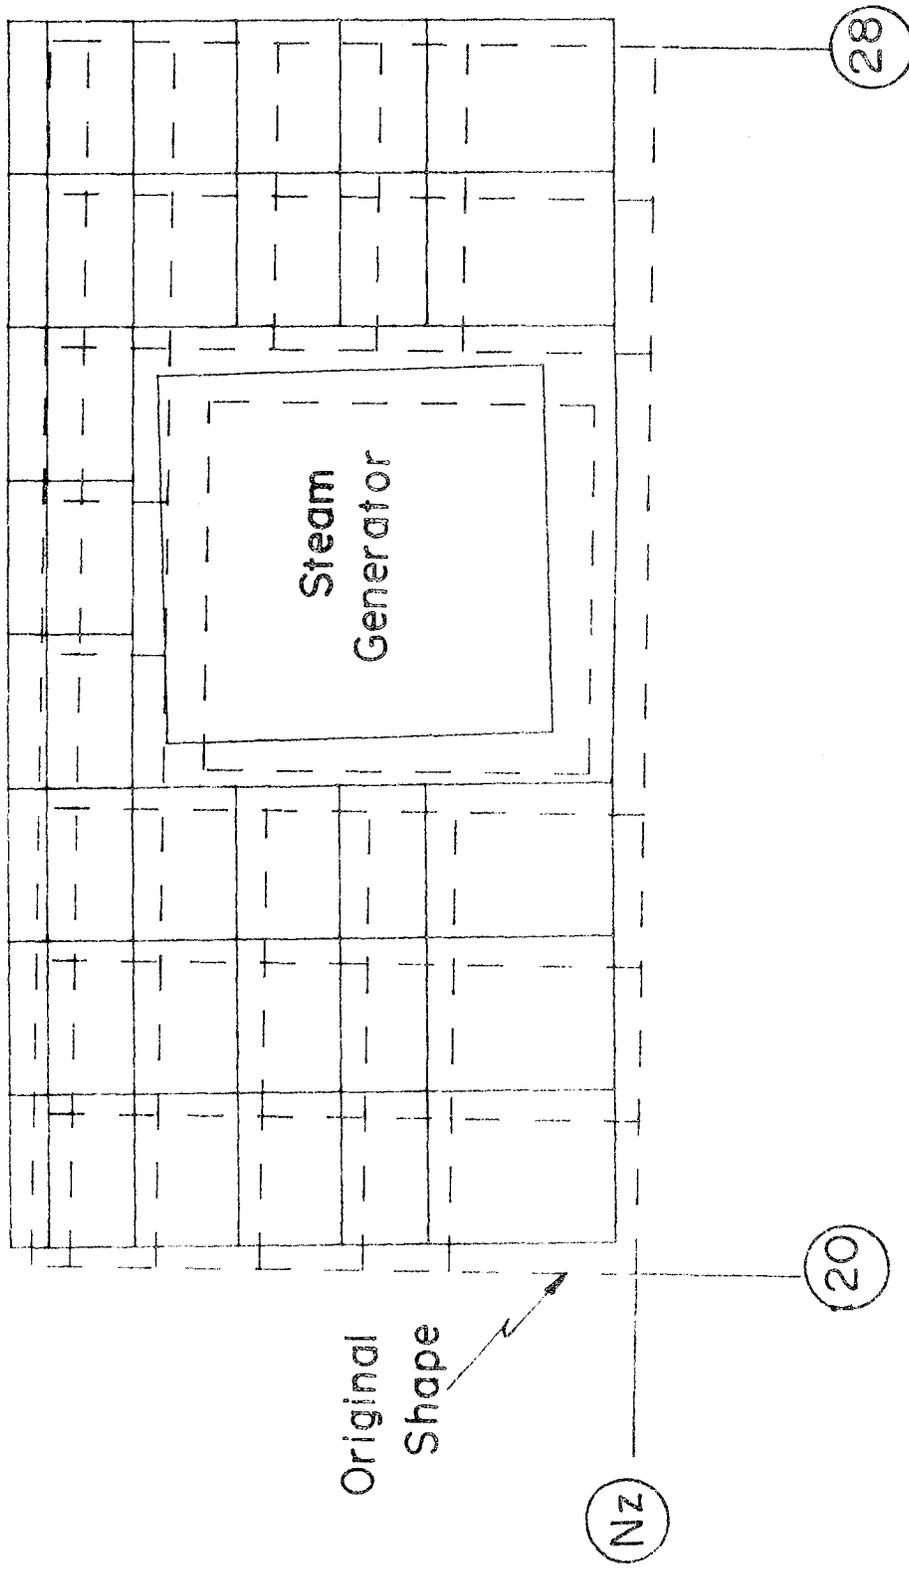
A top view of the horizontal section at 169 feet above ground vibrating in the first mode.
